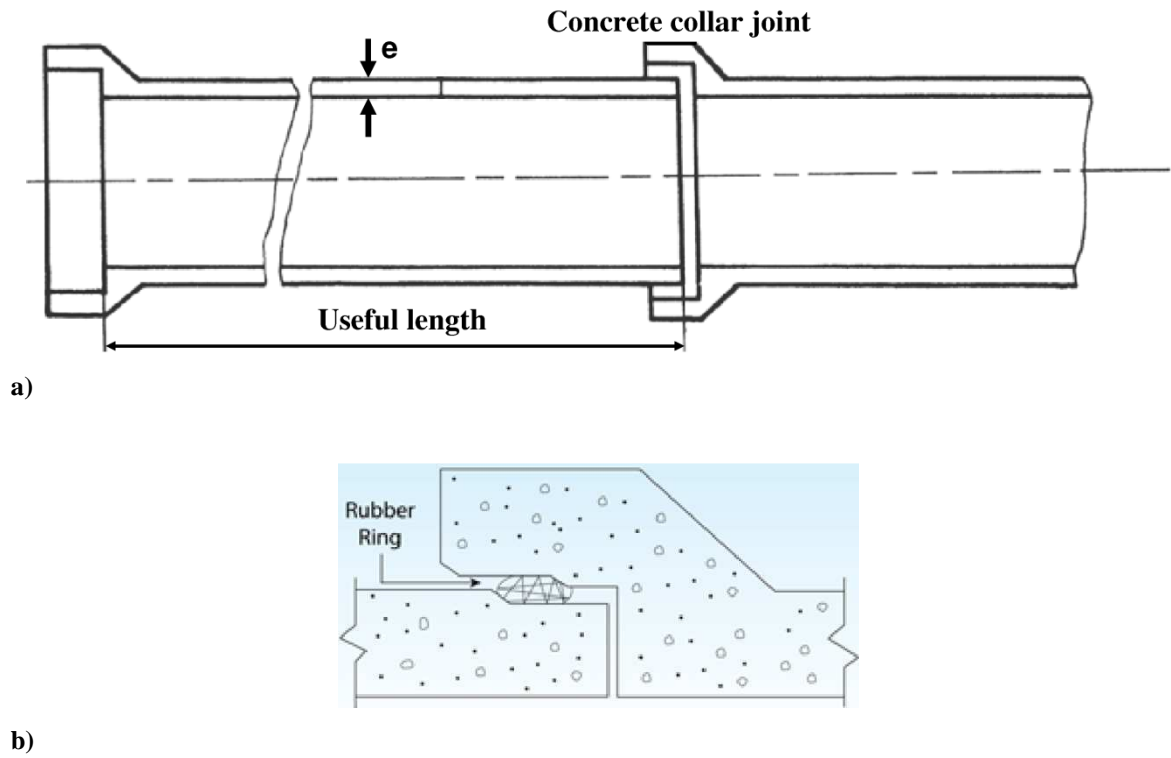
Two kinds of flexible joints a) Concrete collar joint and b) Rubber Ring Joint
